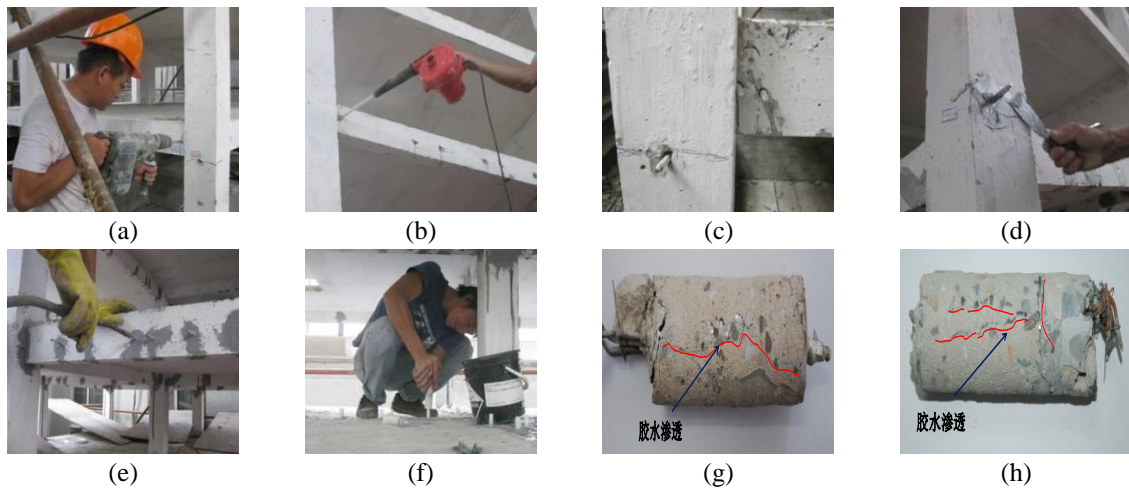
Process of epoxy-injection technique and concrete samples: (a) hole drilling, (b) hole cleaning, (c) pipe installation, (d) crack surface sealing, (e) pressure injecting, (f) slab crack injecting, (g)~(h) core drilled from the repaired concrete
